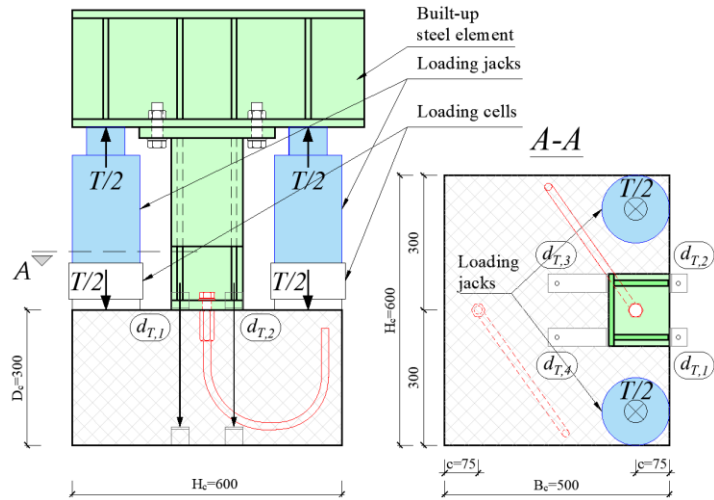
The layout of pull-out specimens used for testing the connection under tension load
